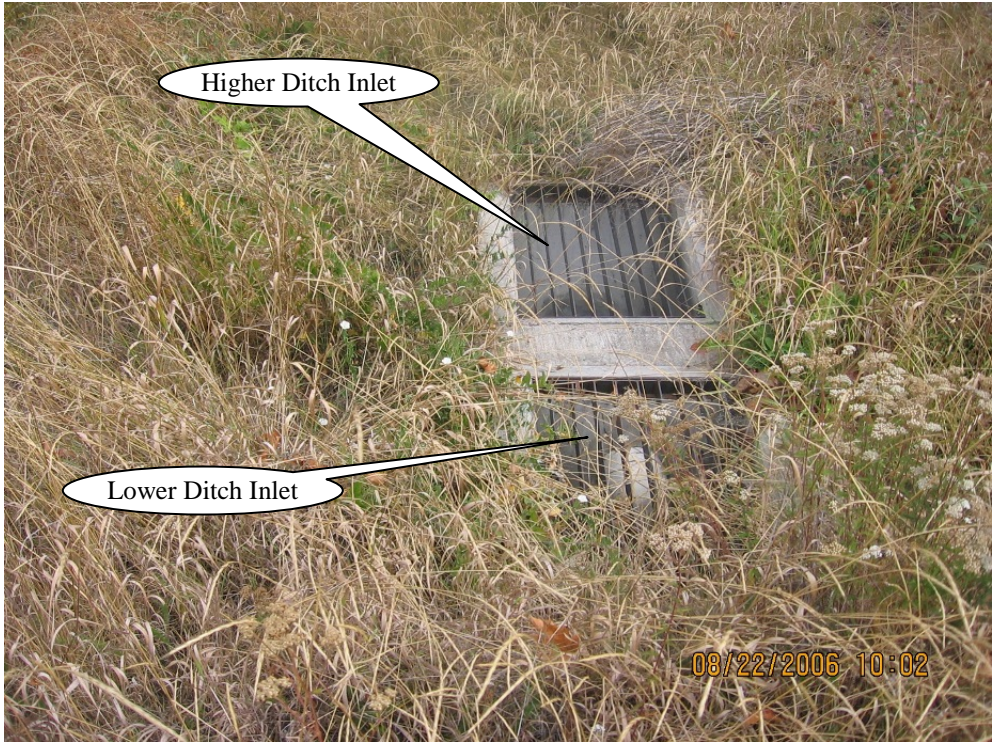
Outlet structures at water quality biofiltration swale outlet (Point B).
